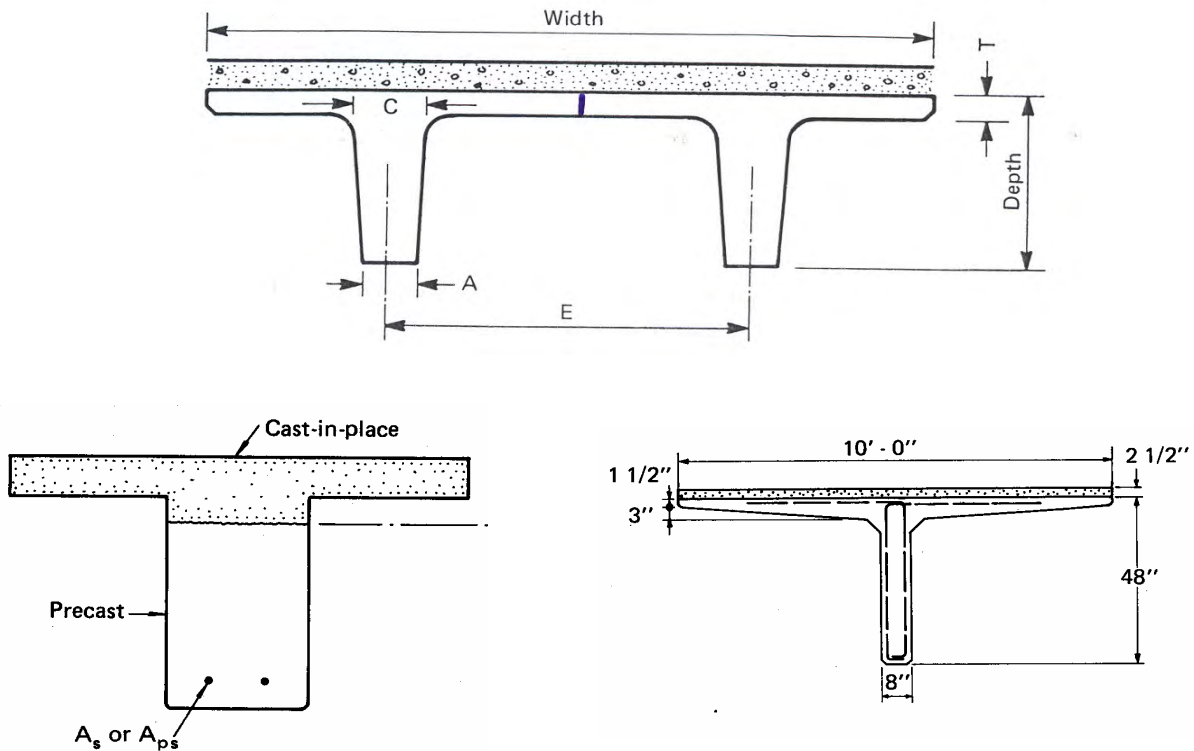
Available typical precast-cast in situ composite sections (2)
